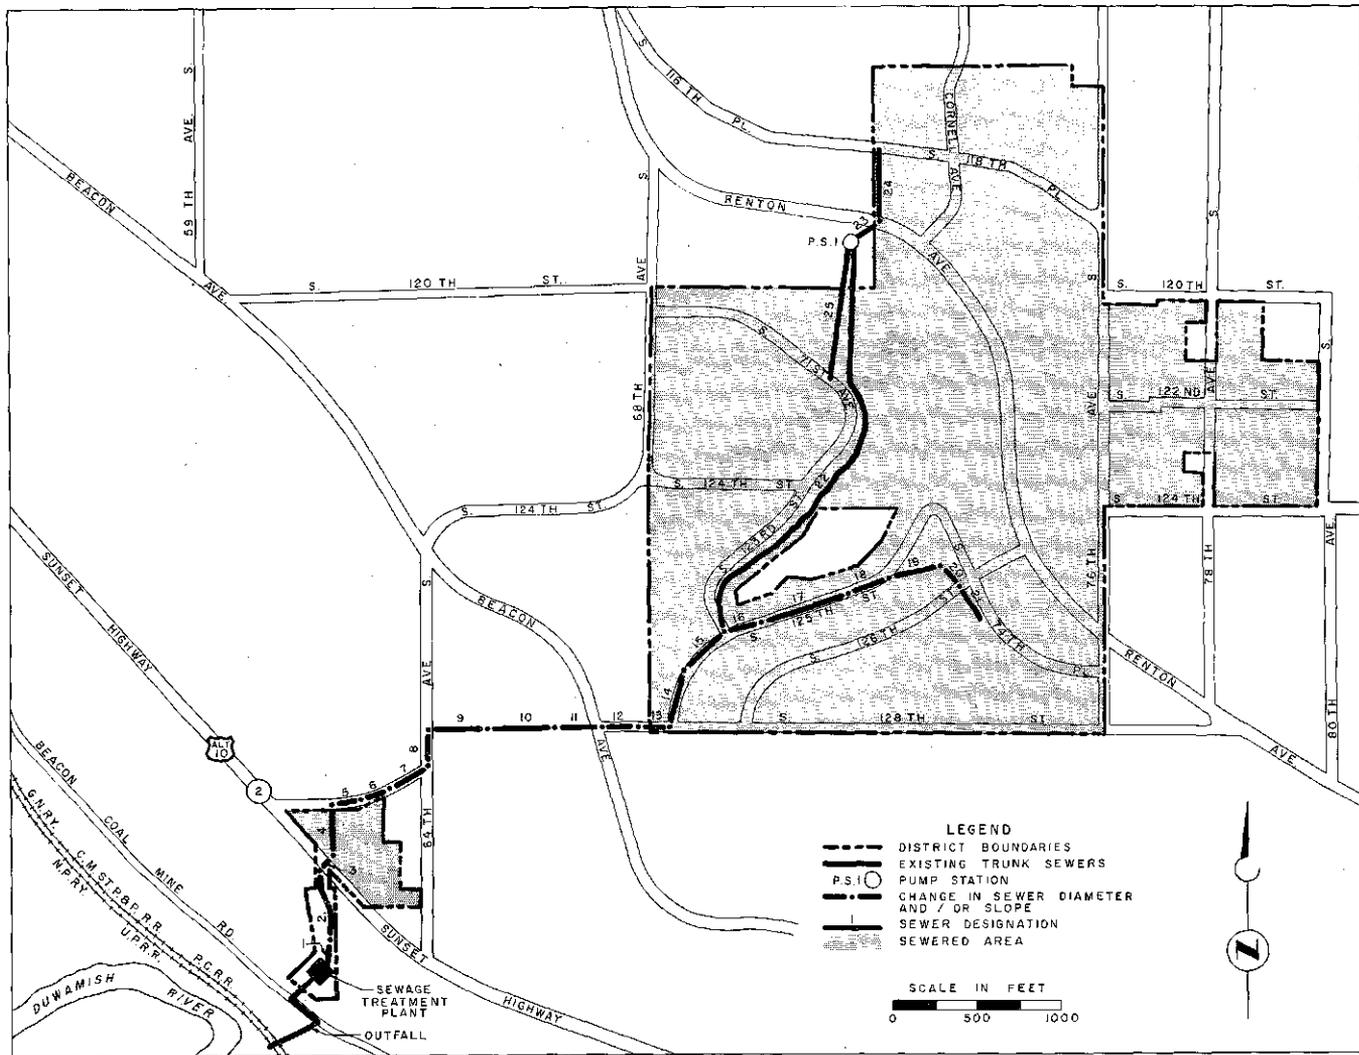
Sewered Area and Principal Sewerage Facilities
